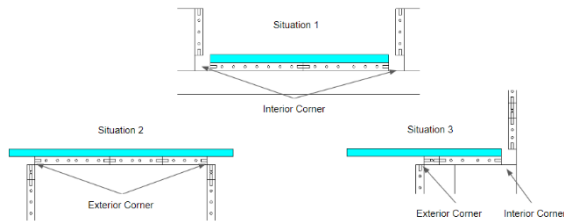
Three situations of walers. (1) Two interior corners. (2) Two exterior corners. (3) One interior corner and one exterior corner.
